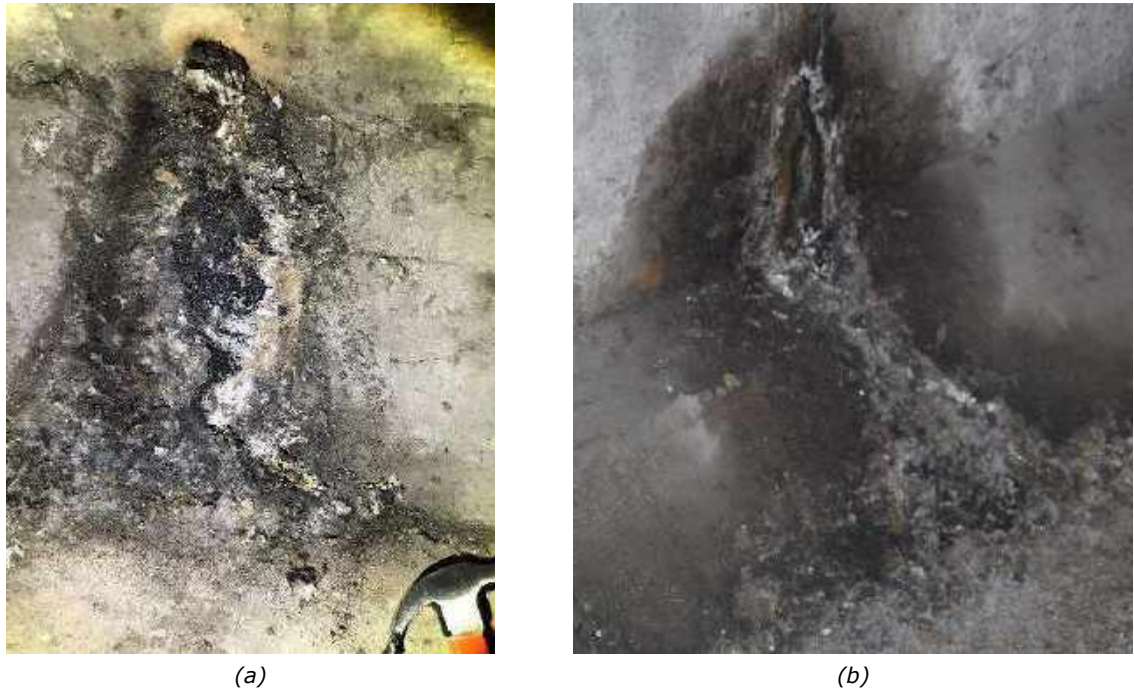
Examples of drainpipes in the outer wall of air ducts with leaking water and crystal deposits: (a) Downstream Air Duct, Element 1, Door 6/7, (b) Downstream Air Duct, Element I, Door 5/6.
